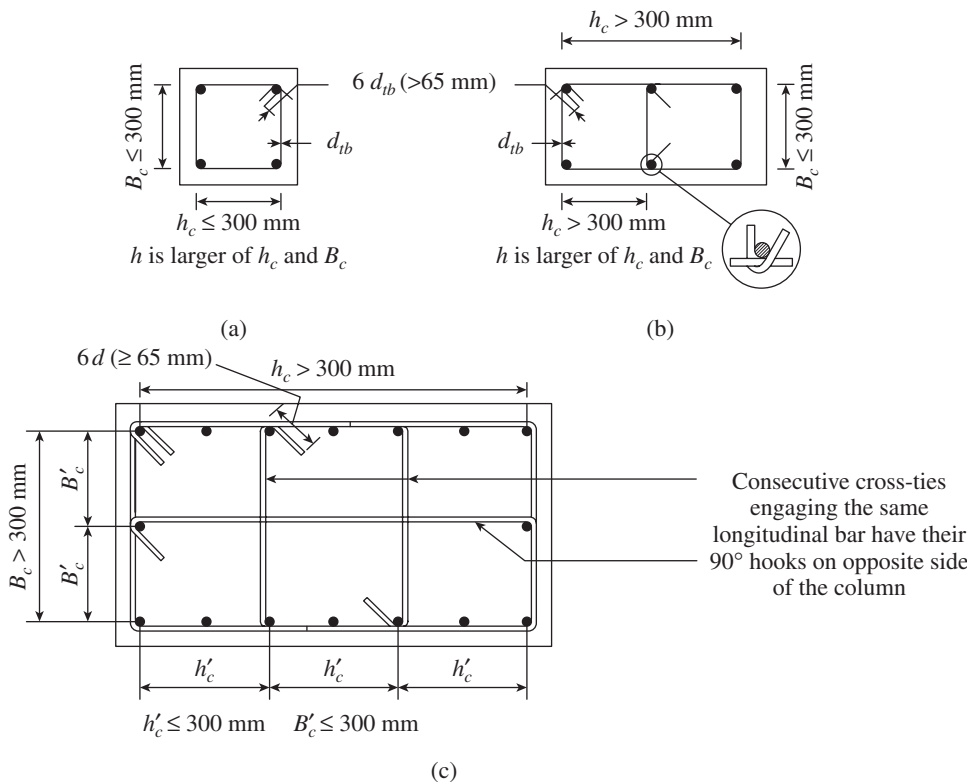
Transverse reinforcement in columns (a) Single hoop (b) Single hoop with a cross-tie (c) Overlapping hoops with cross-ties
